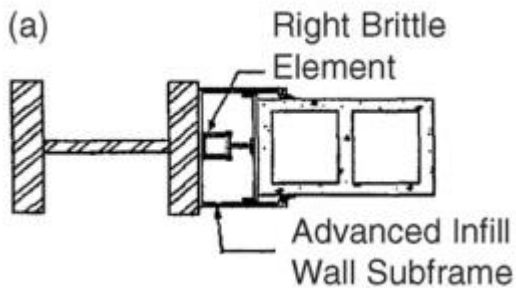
Details of SIWIS subframe system between infill wall and column from [11]
